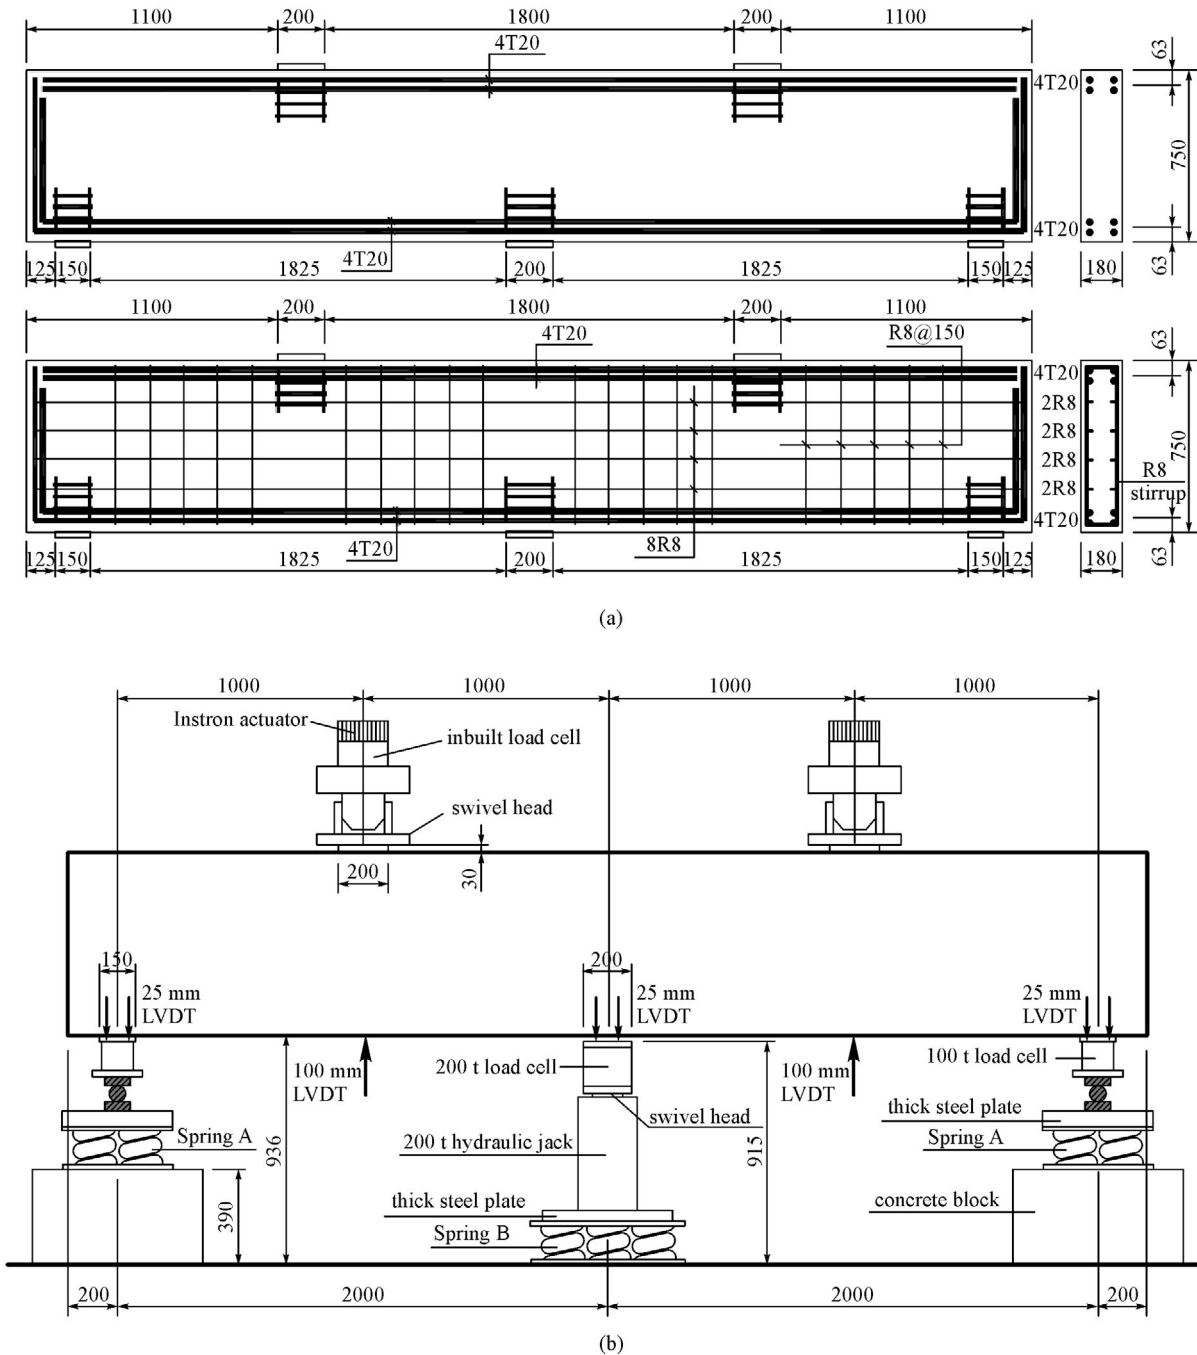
Dimensions of RC deep beams and typical reinforcement layout (courtesy of Zhang and Tan [3]). (a) Details of tested specimen; (b) details of loading set-up
